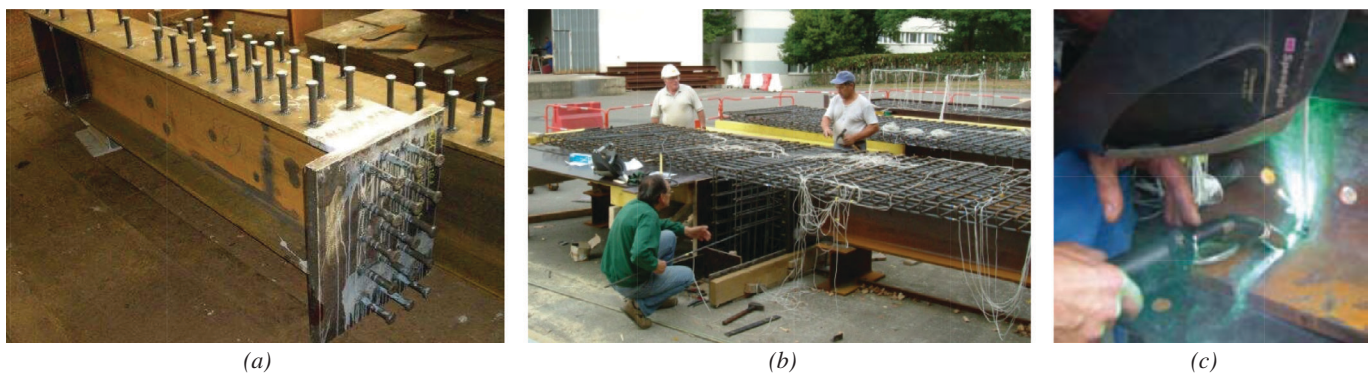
(a) ArcelorMittal fabrication; (b) INSA fabrication; (c) implementation of direct contact (photographs courtesy of Professors Mohammed Hjiaj and Alain Lachal).
